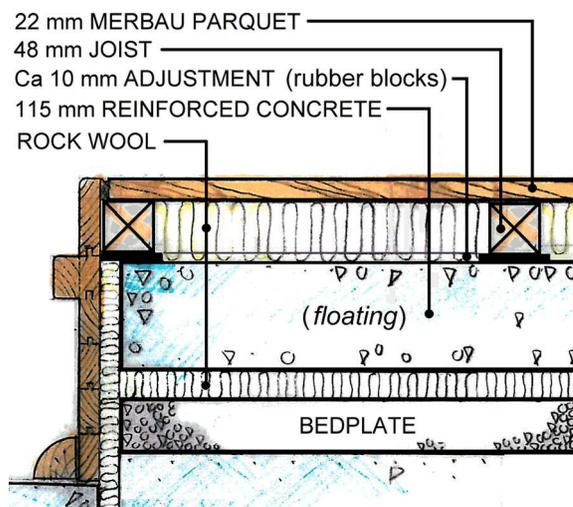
(Color online) Stage-floor construction in LiH. The joists, only 30 cm apart, are resting on floating, reinforced concrete, with thin rubber blocks in between. (Drawing made available by courtesy of Arkitektgruppen Lille Frøen AS.)
